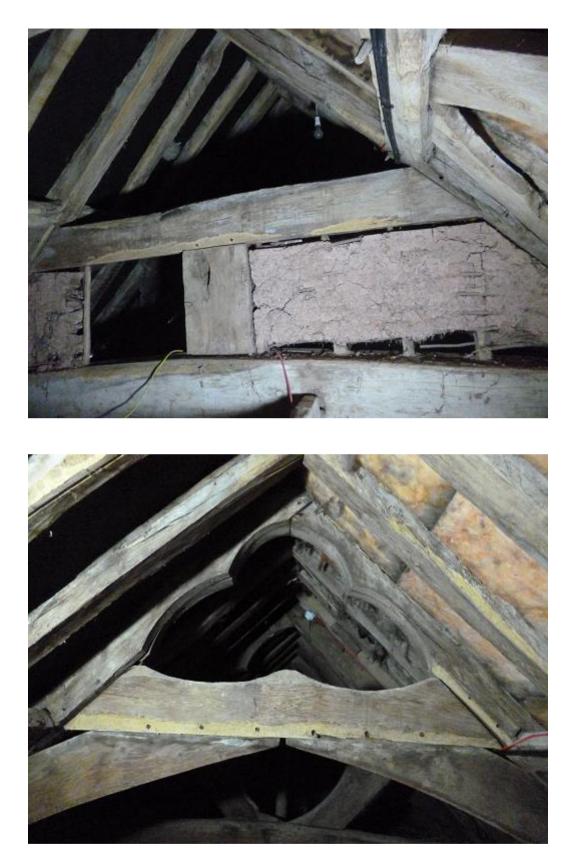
/b: Views of cross-wing roof trusses; closed crown-stud truss (top) and open trefoil cusped truss (bottom)
